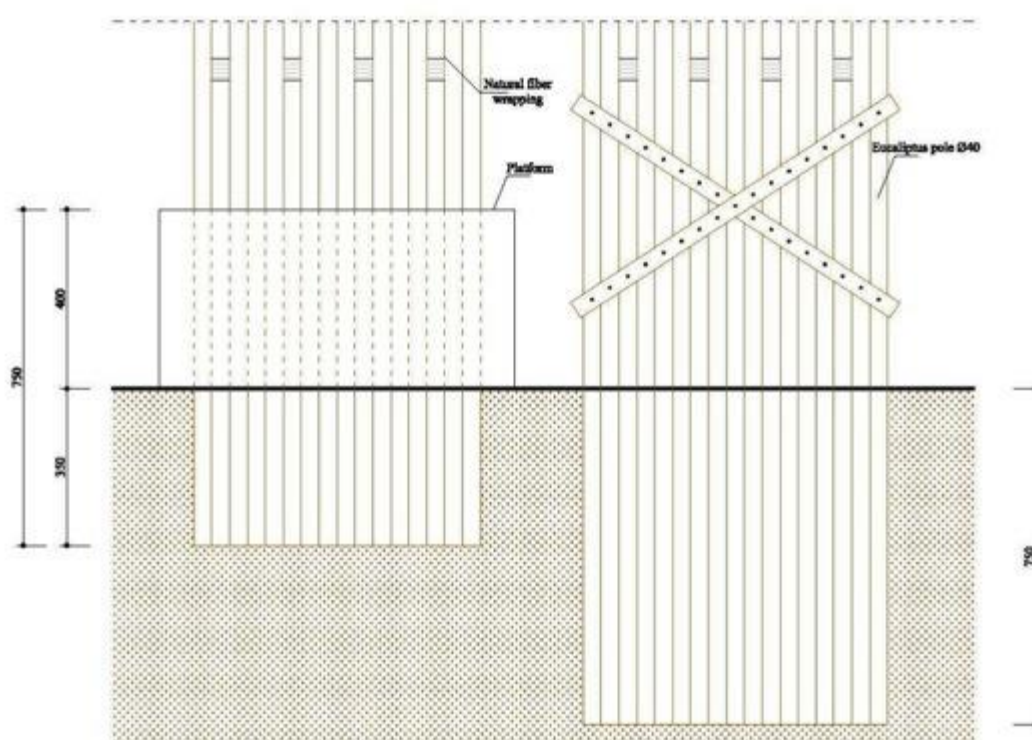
Suggested anchorage length and lateral bracing details for wooden poles
